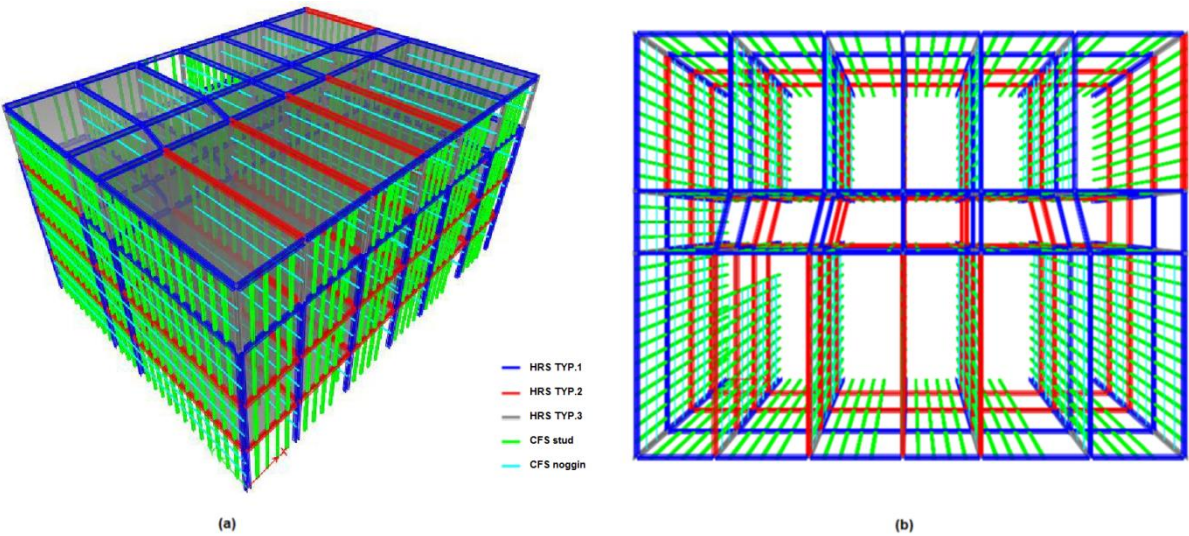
3D model of the conventional OMRF structure a) 3D view b) top view
